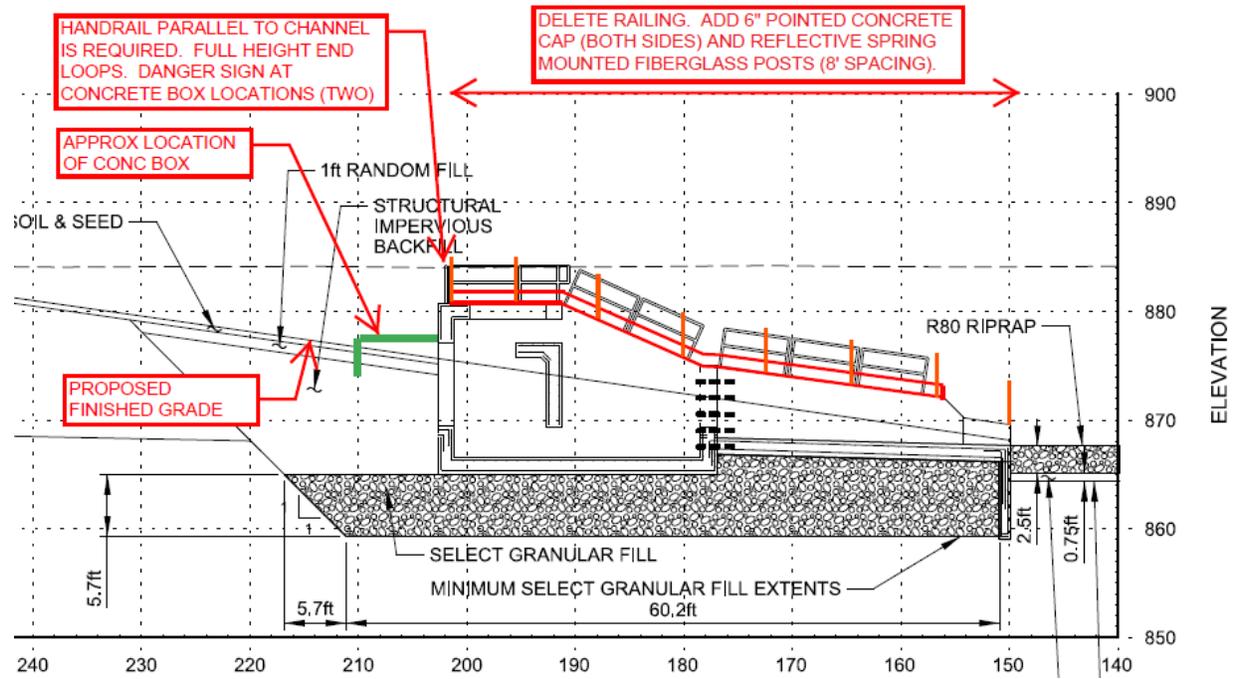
DRAIN 30-FINAL DESIGN REVISION
